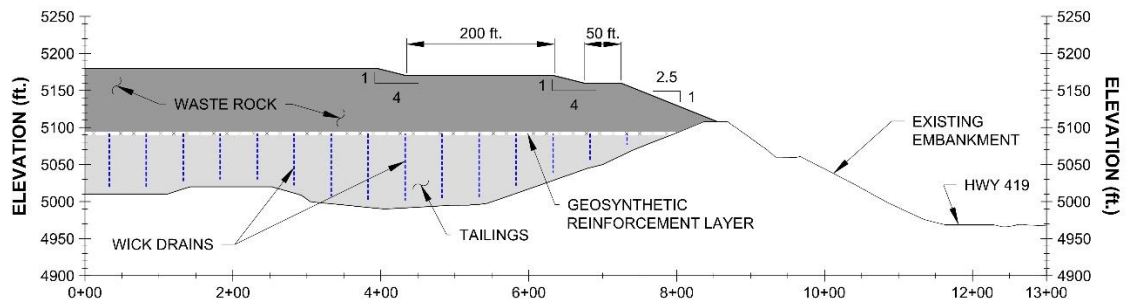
Proposed Nye WRSA Arrangement Cross Section
